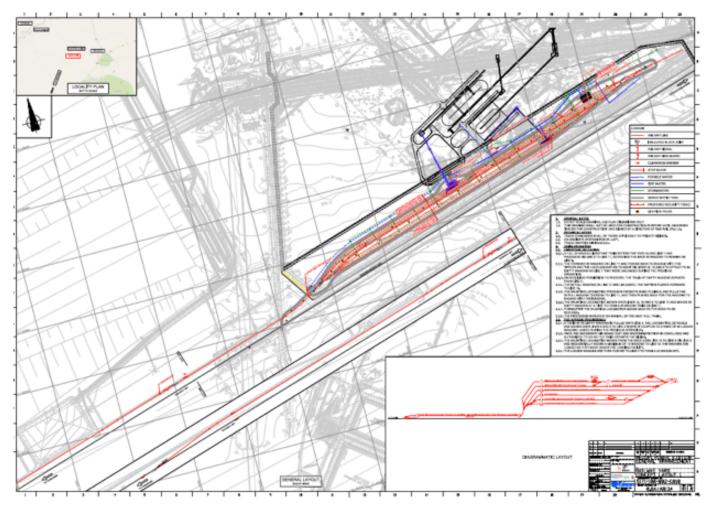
The proposed railway yard south-west of Medupi six units and south east of the existing and licensed ADF
